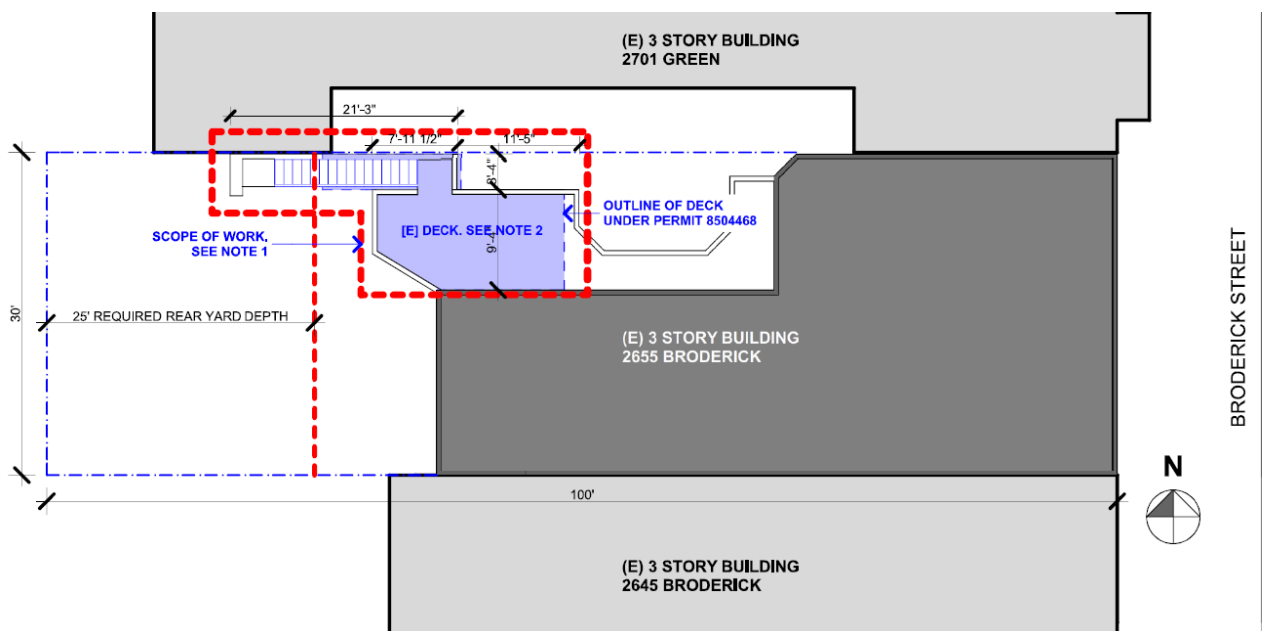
Site Plan showing scope of work under "Permit 1" (from DNM Architect)
